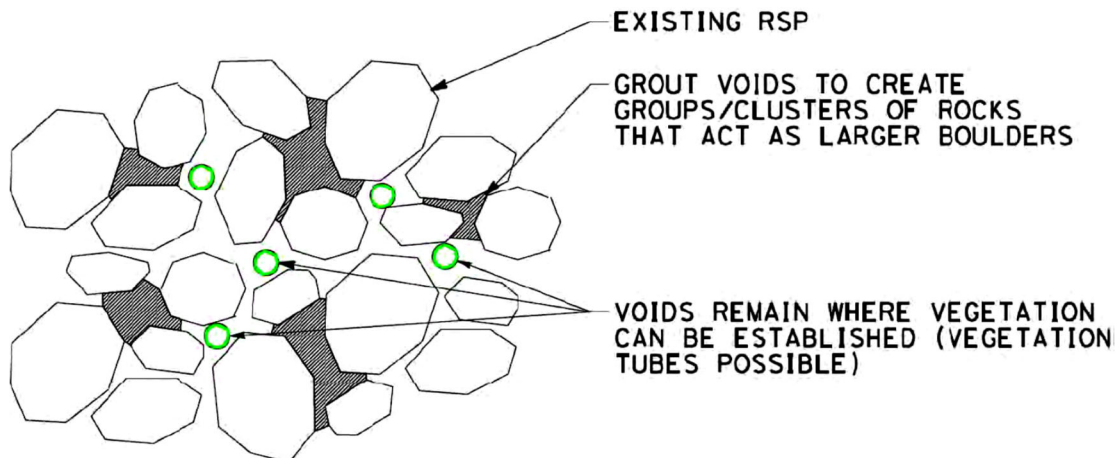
Plant Tubes Within Grouted Rock Slope Protection
